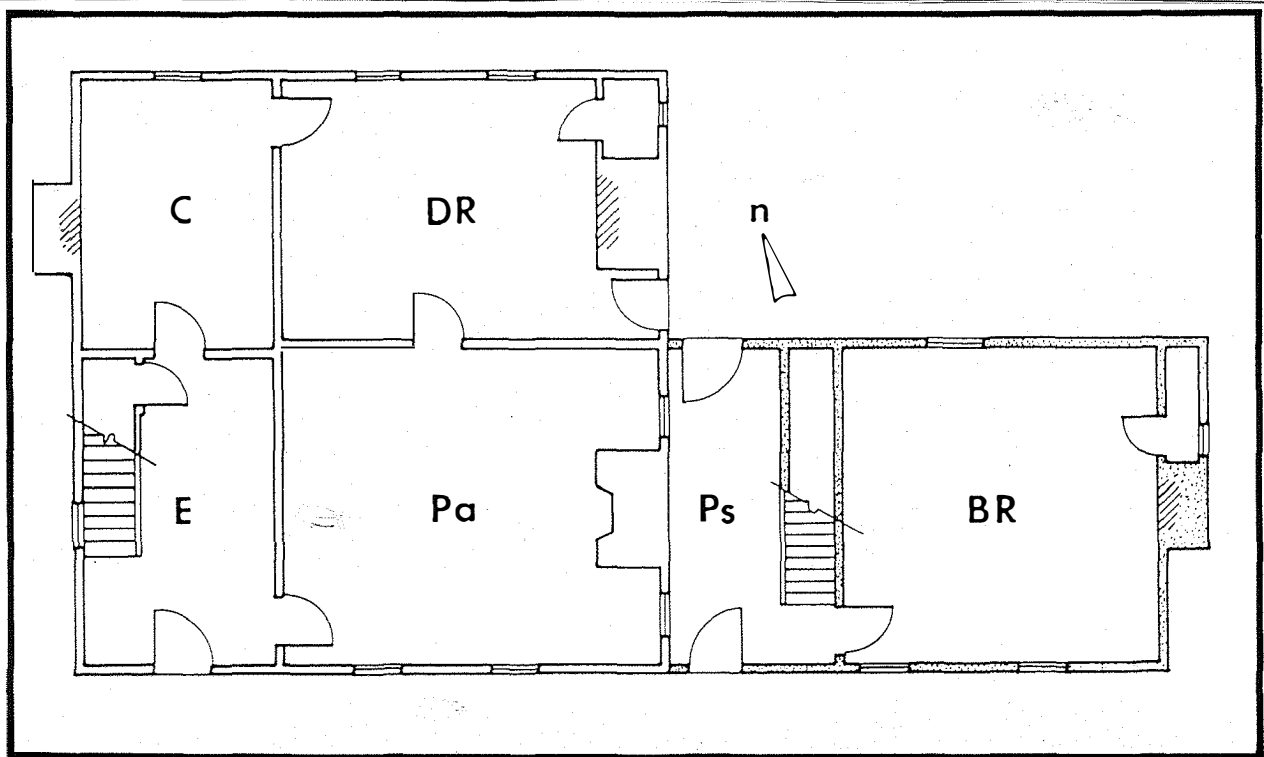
Floor plan of Timberneck, Structure 36-74 (Upton 1986:330).
